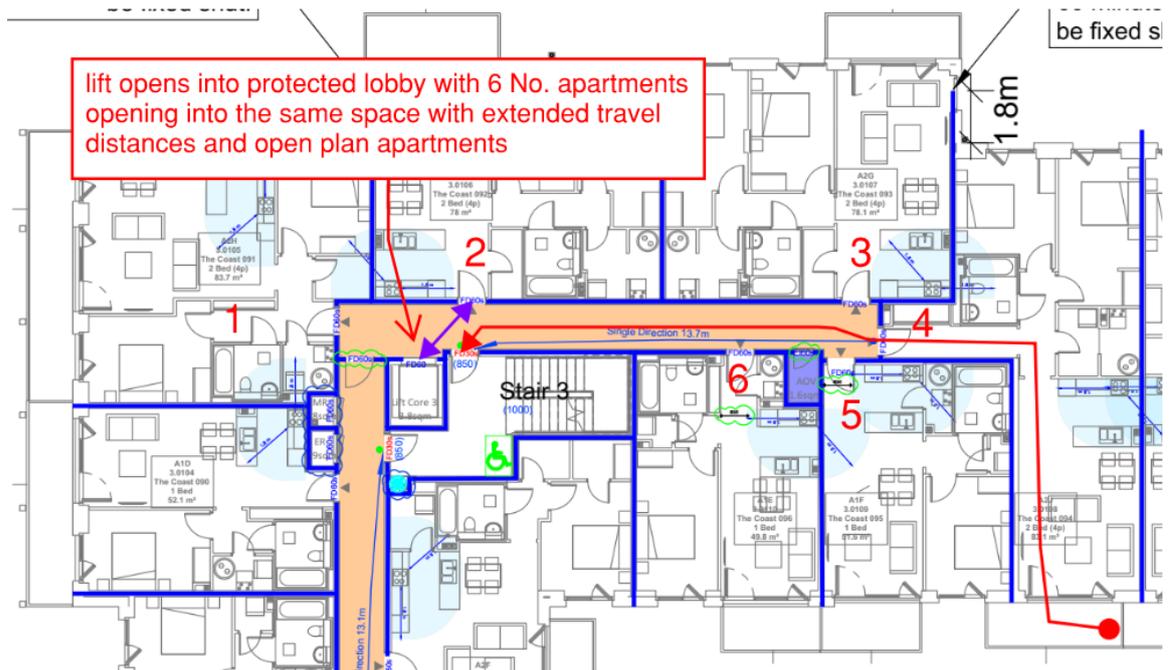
Block B, Core 3 – typical floor plan layout showing the close proximity between the lift door and stair
